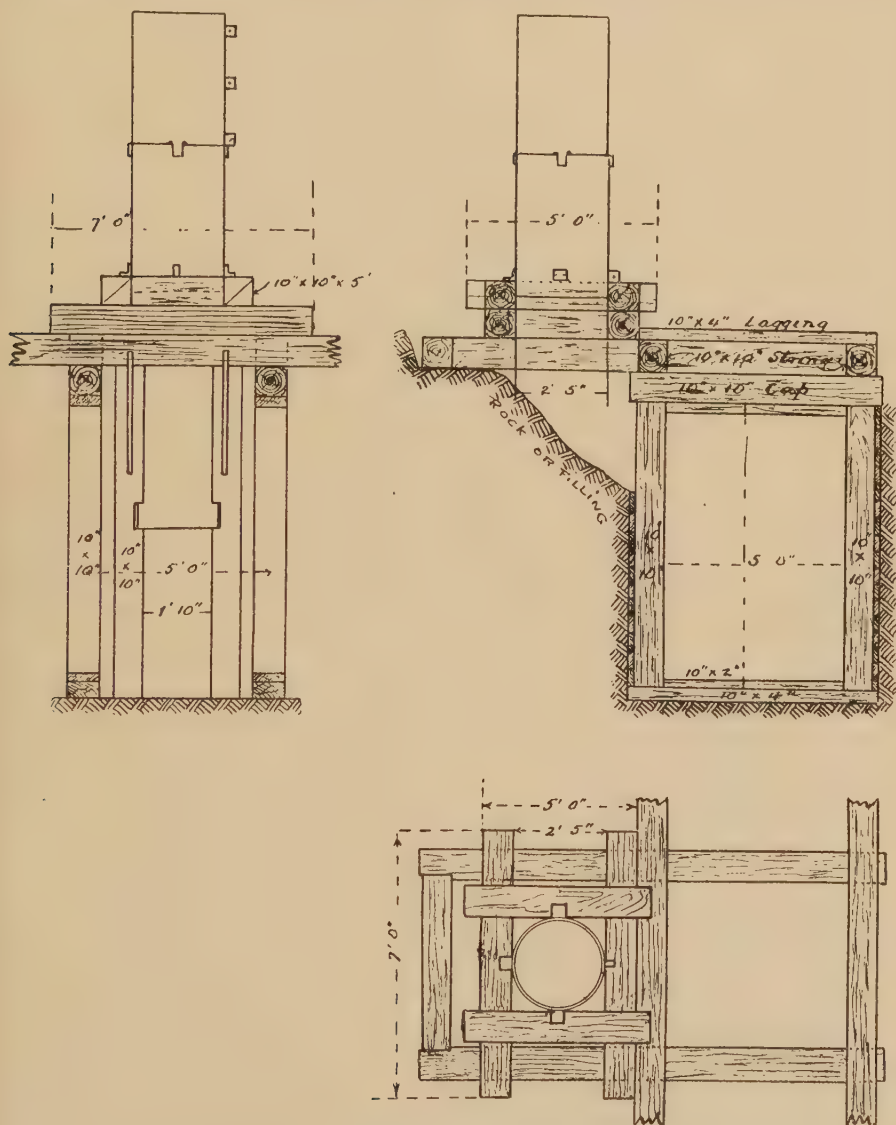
Timber foundation for cylindrical steel ore-chute.
